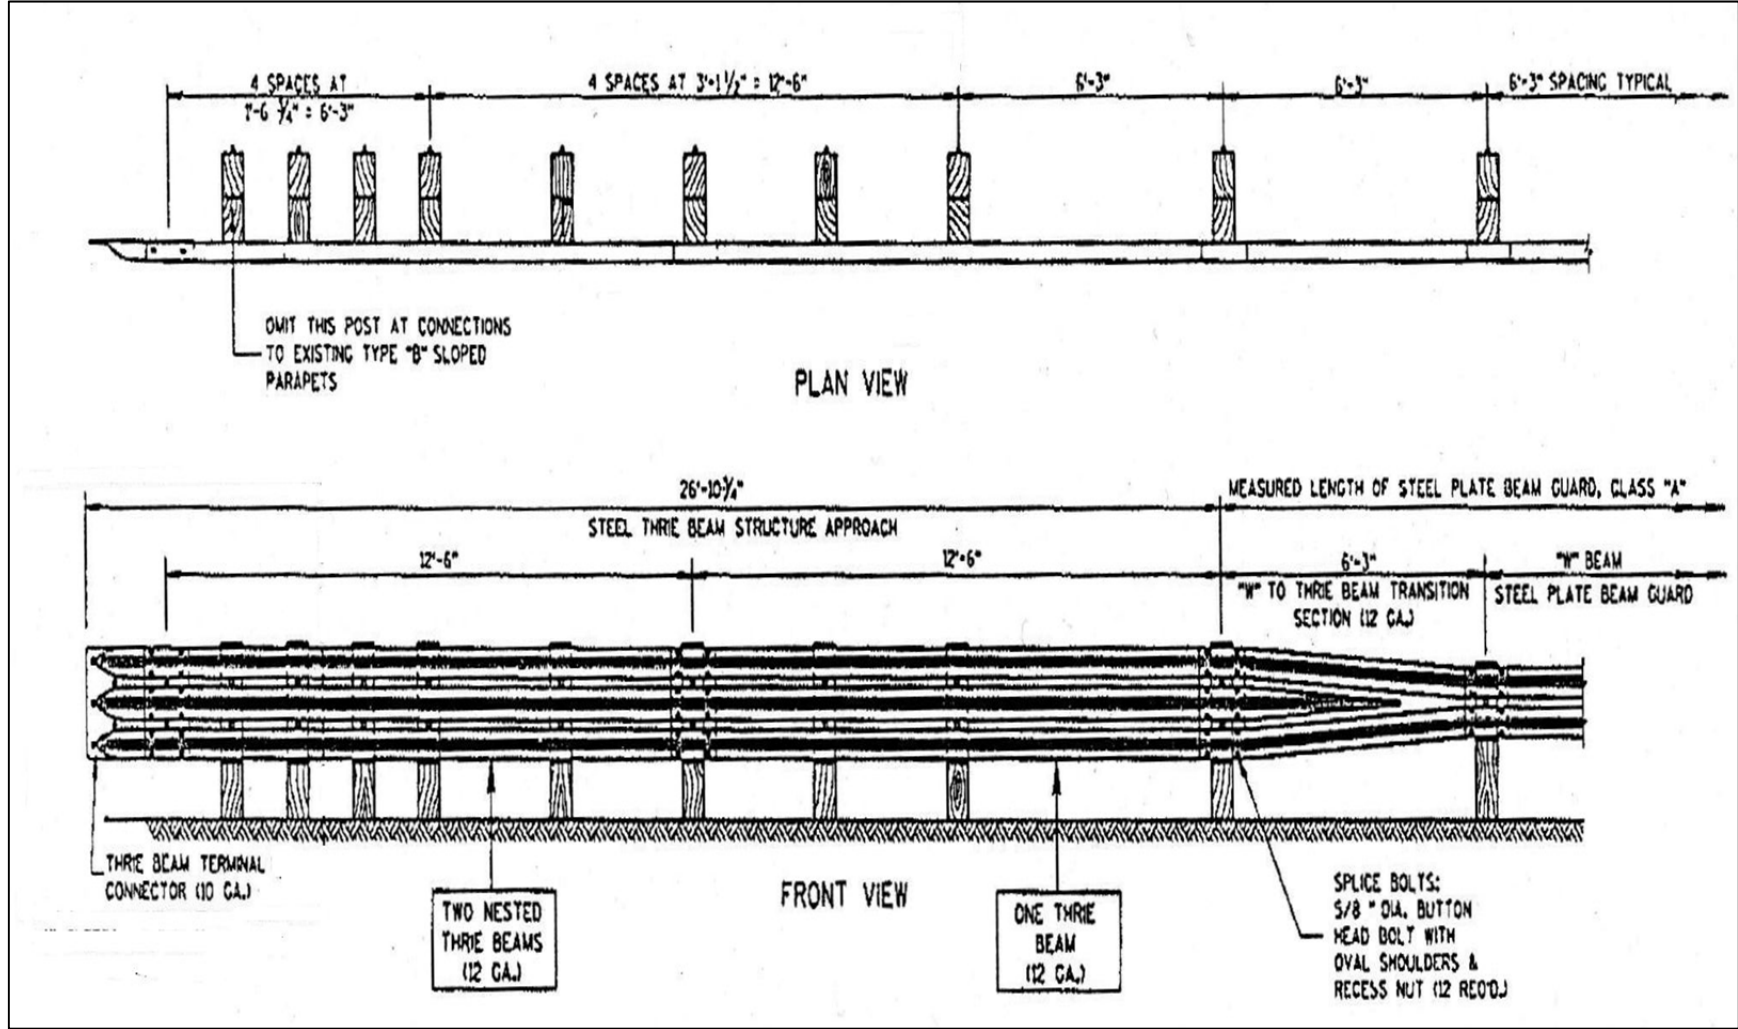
31-ft 3-in. (9.5-m) Long, Wisconsin Approach Guardrail Transition [3]
